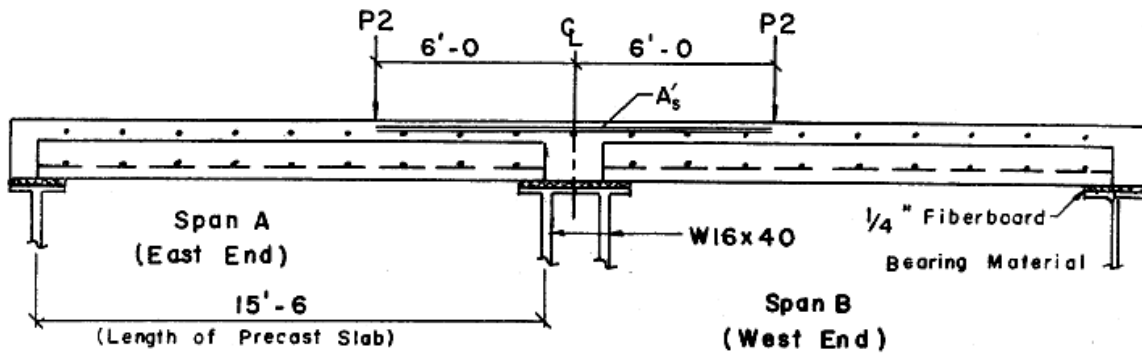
Elevation view of the lab specimen used in the study performed by Hays, Jr. et al. (1980)
